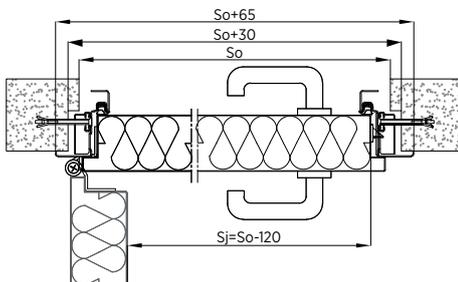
Installation of the single-leaf door to a masonry wall - corner frame with a thermal break - horizontal cross-section
